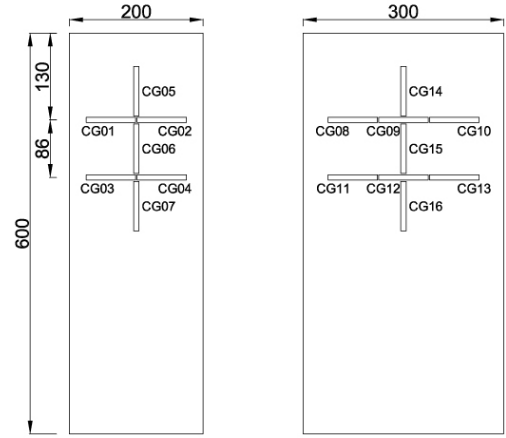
Concrete strain gauges for load transfer test (All units: mm)
